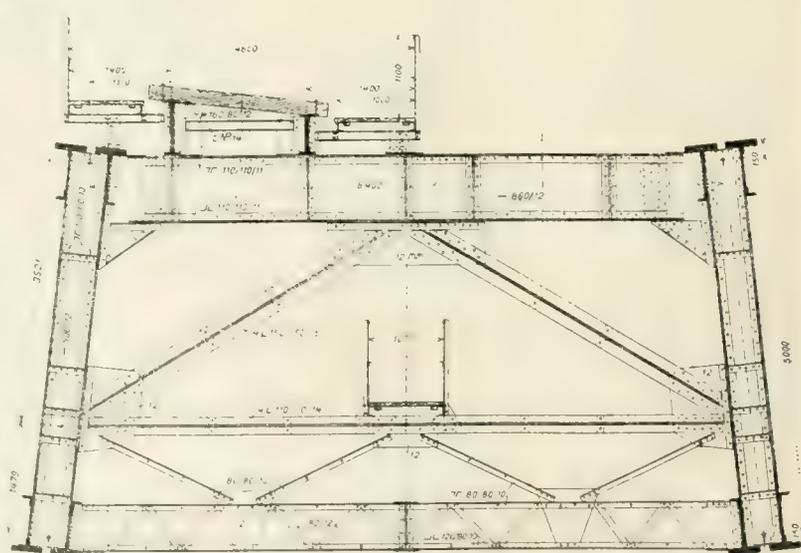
Cross-Section at Center of Arch Span of Bietschtal Viaduct. One Track Provided at This Time.
